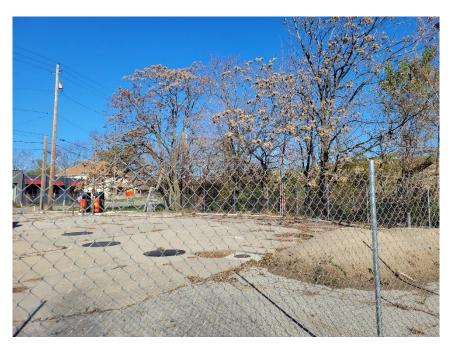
Subject Site from Pleasant Run Pkwy NDR
